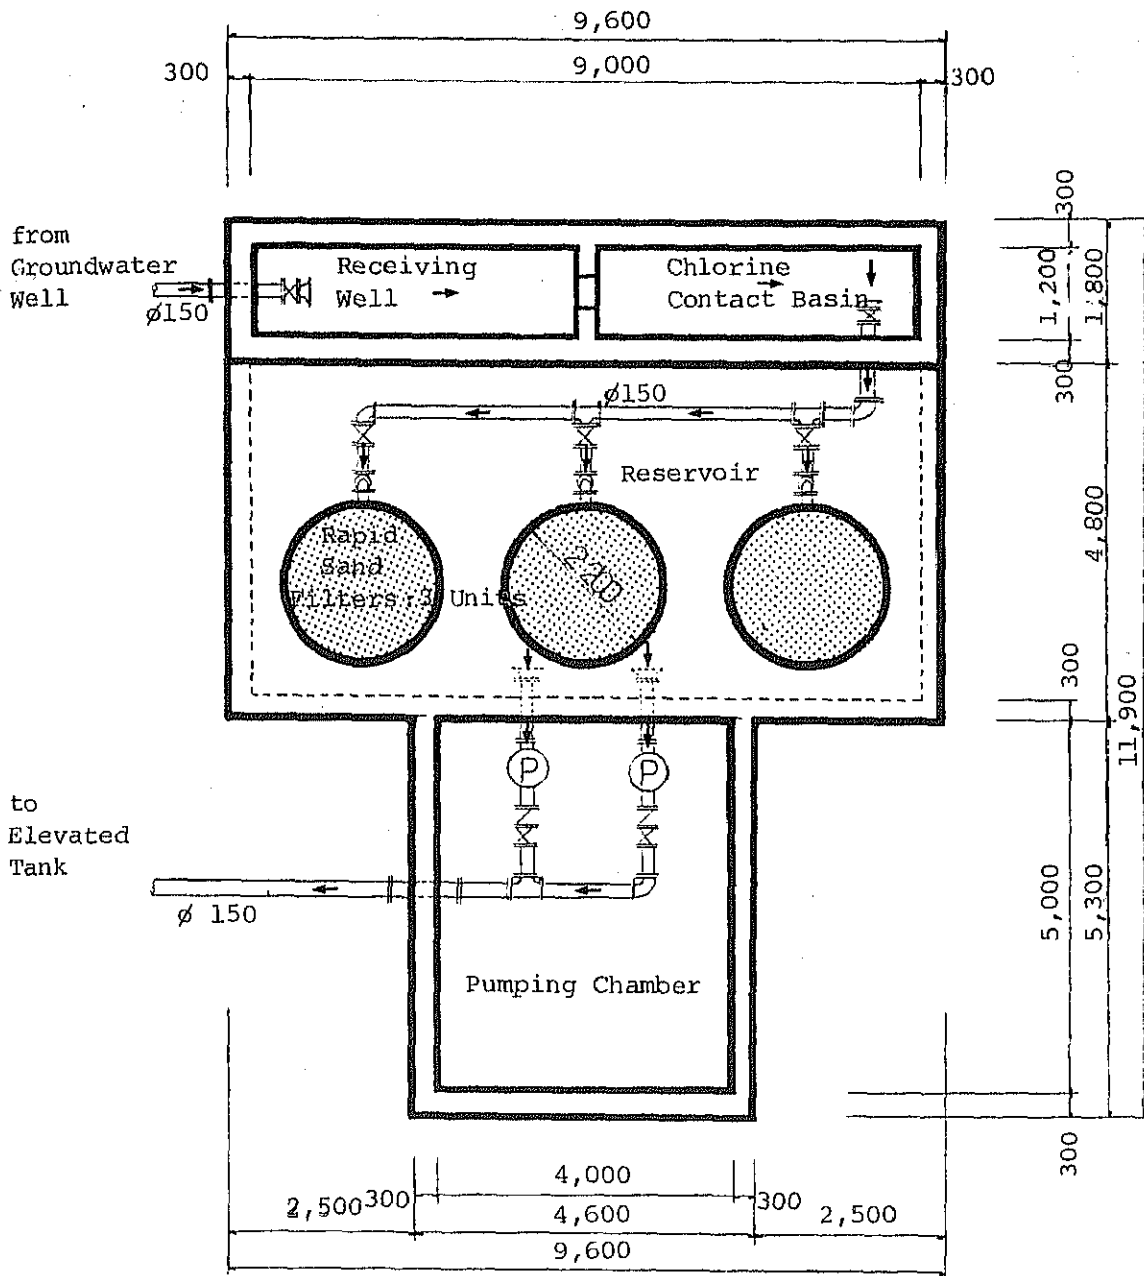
TYPICAL LAYOUT OF SAND FILTRATION FACILITY FOR GROUNDWATER
